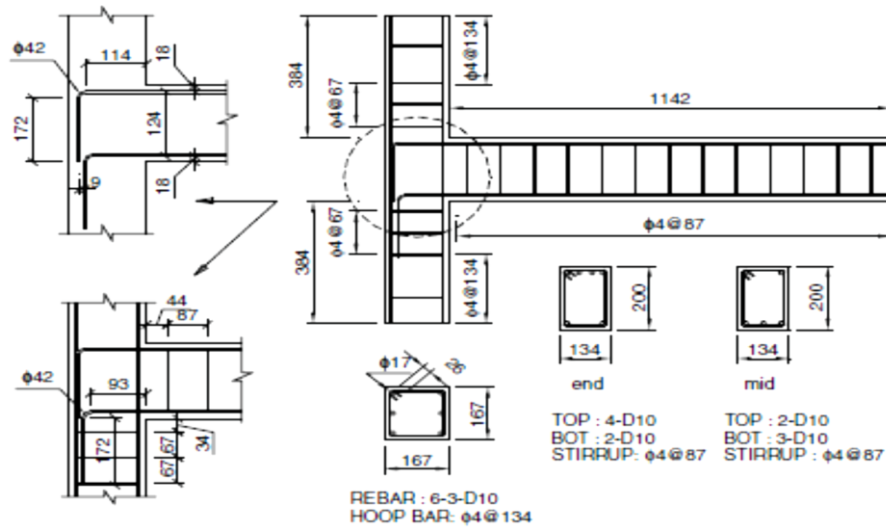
Reinforcement Detailing of Pre-Seismically Designed Test Specimens. (Lee-Trung et al., 2010)
